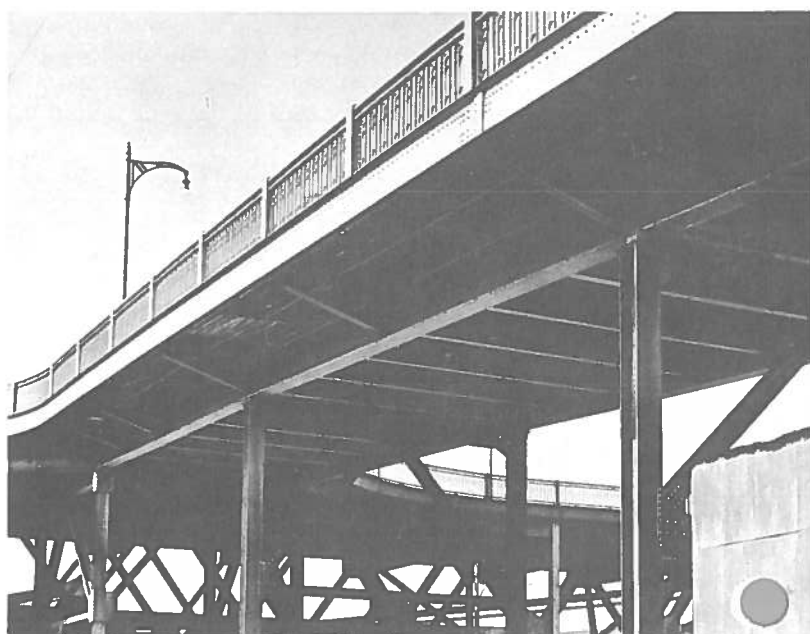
ROLLED WIDE FLANGE BEAM BRIDGE, PENNSYLVANIA
